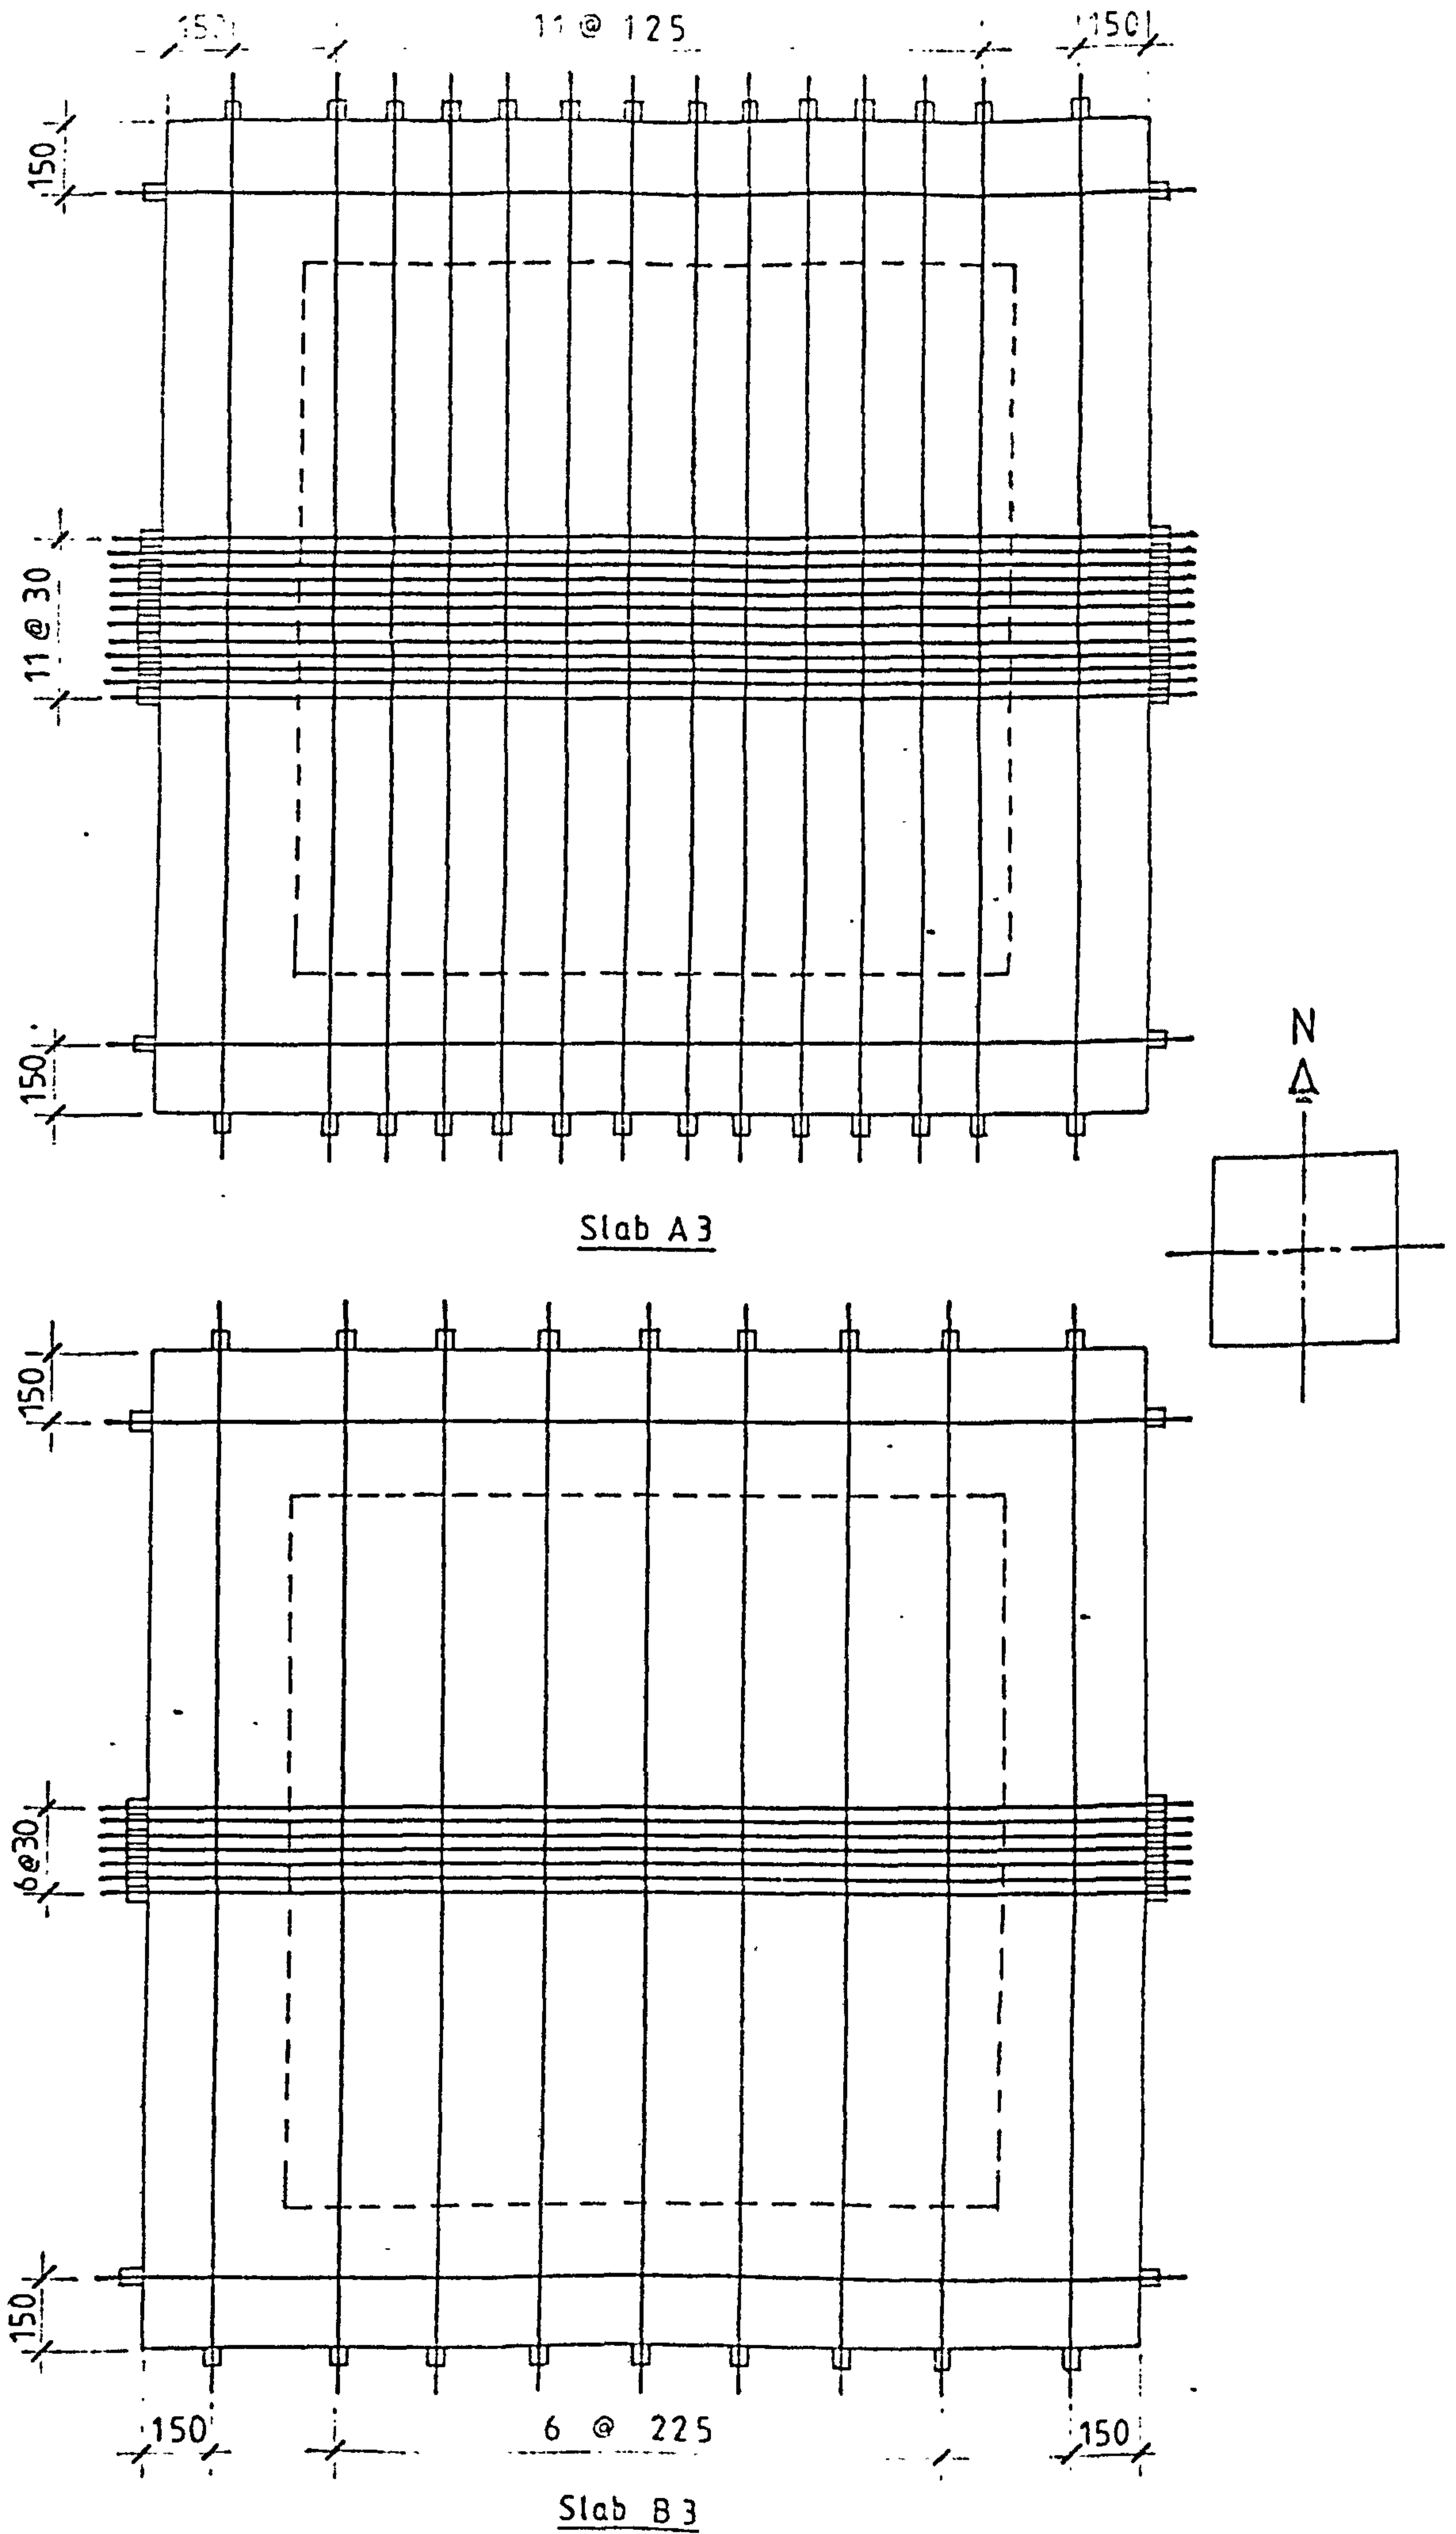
Tendon arrangement of slabs A3 & B3
